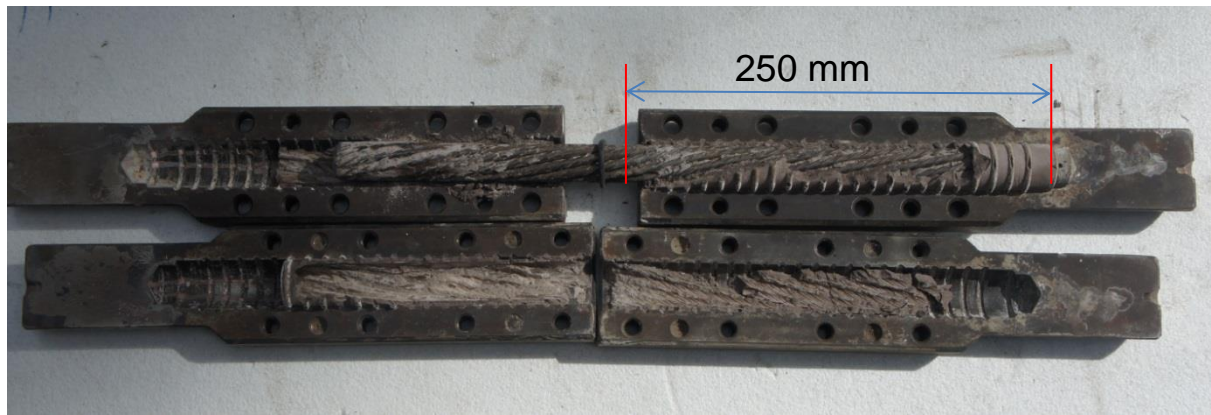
Post-test two halves of the pull out apparatus with encapsulated cable bolt
